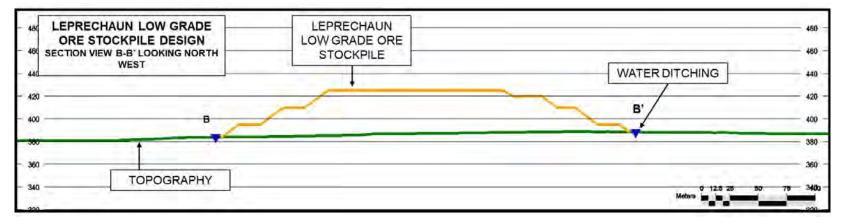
Leprechaun Low-grade Ore Stockpile Design – Section View B-B' Looking Northwest
